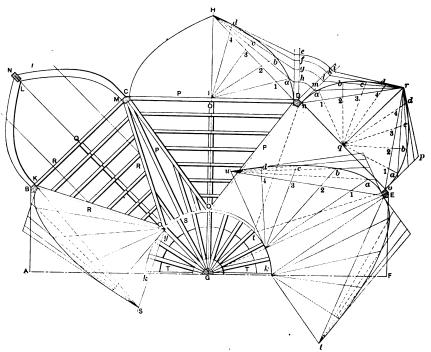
A Groined Vault on an Irregular Octagonal Plan.
